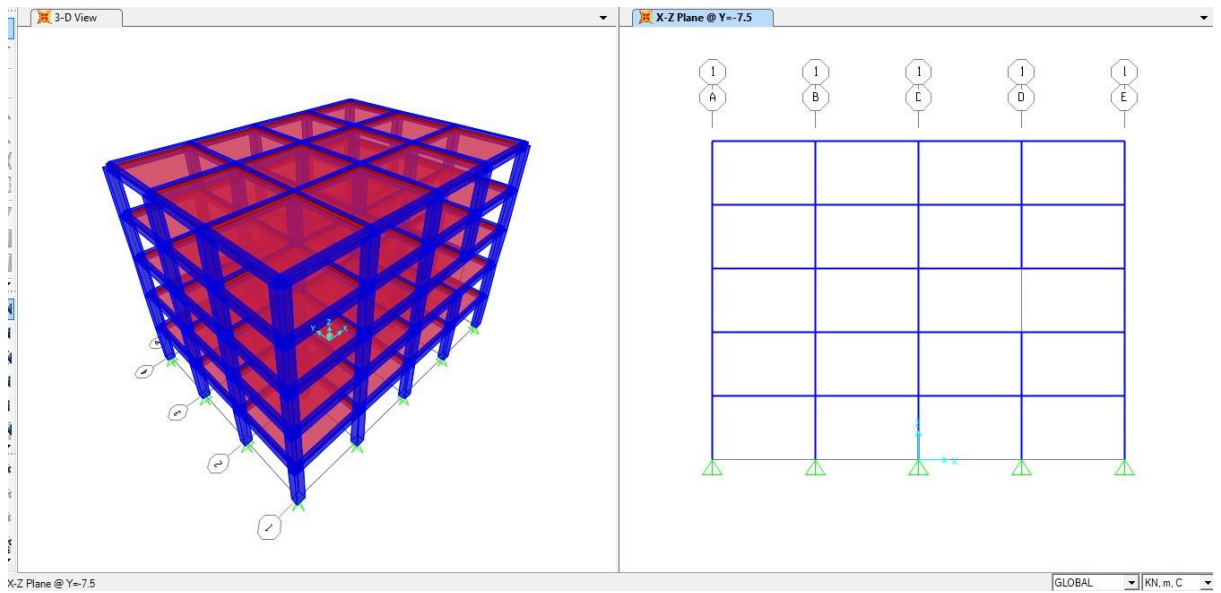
Extruded 3D view of model showing floating column at 2nd floor
